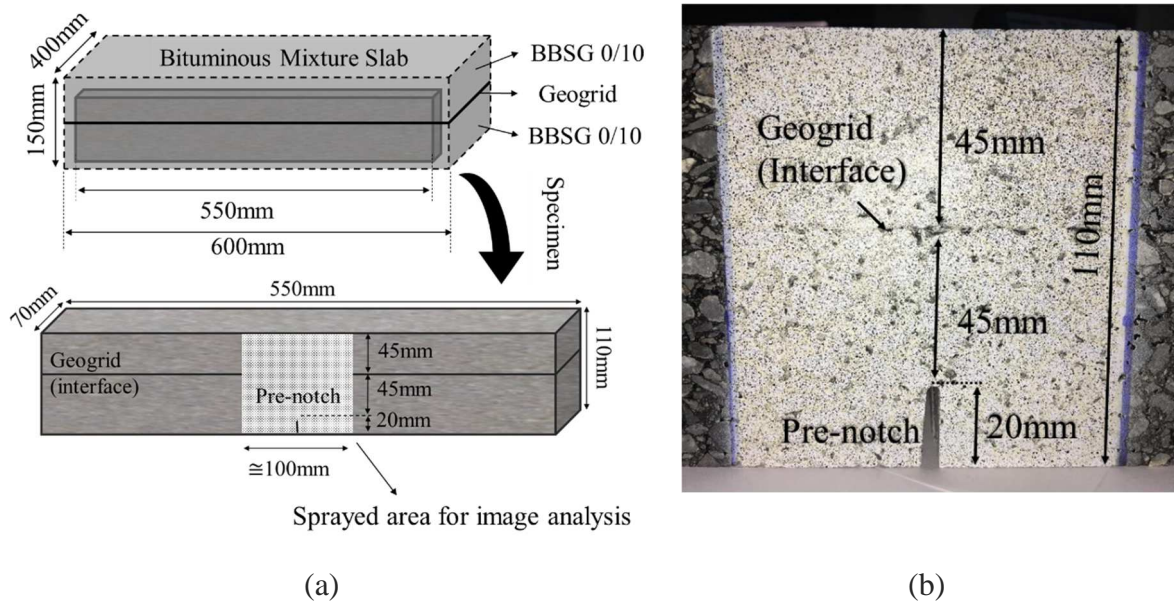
Detail of beam specimen obtained from sawing and prepared for testing: (a) position of specimen from the slab, and (b) pre-notch size and interface position in beam height
